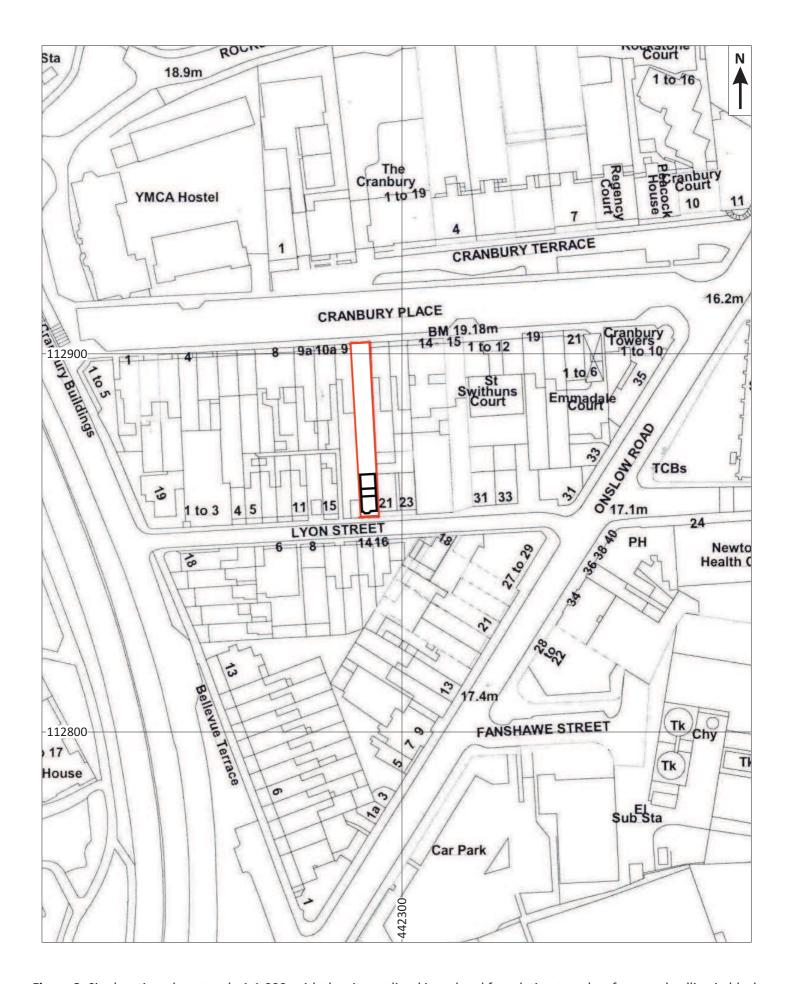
Site location plan at scale 1:1,000, with the site outlined in red and foundation trenches for new dwelling in black
